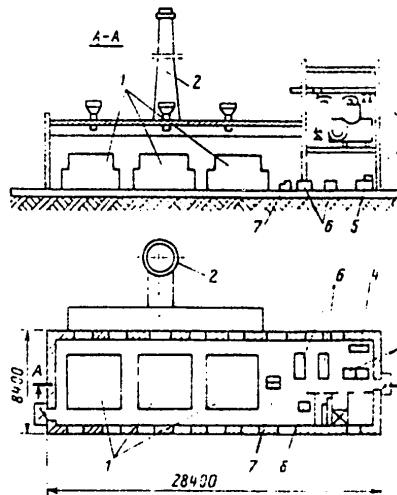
Layout drawing of a group boiler plant with small cast-iron boilers
